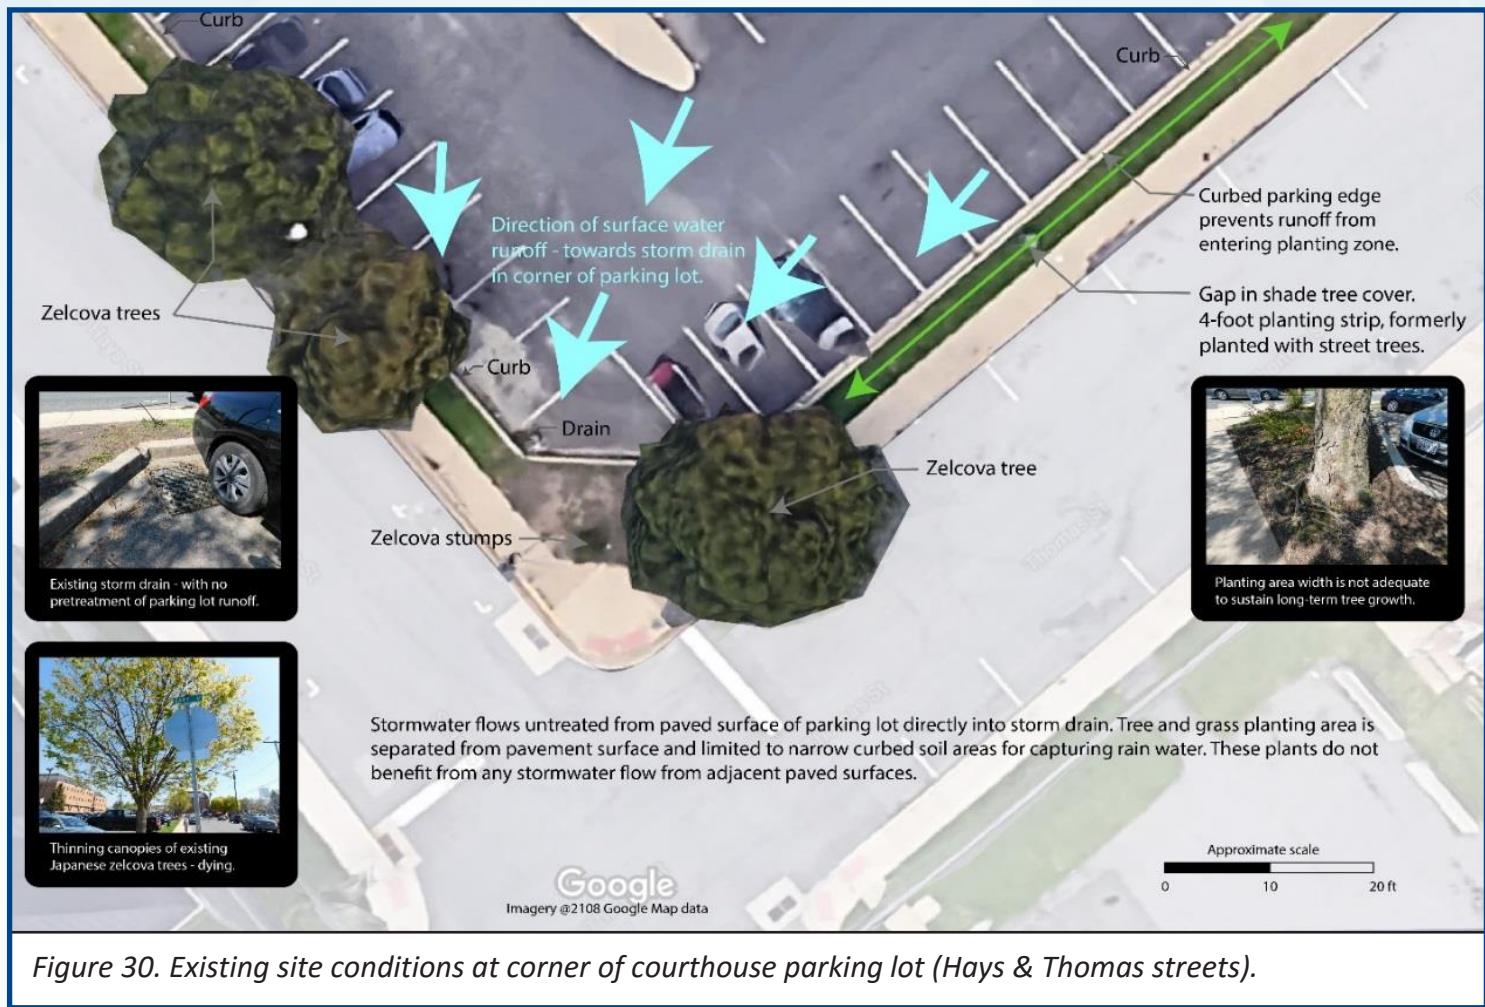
Existing site conditions at corner of courthouse parking lot (Hays & Thomas streets).
